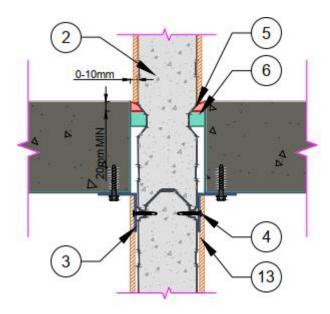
Dual wall system with vertical wall between horizontal walls –gap width of 0-10 mm between the stair and horizontally oriented wall
